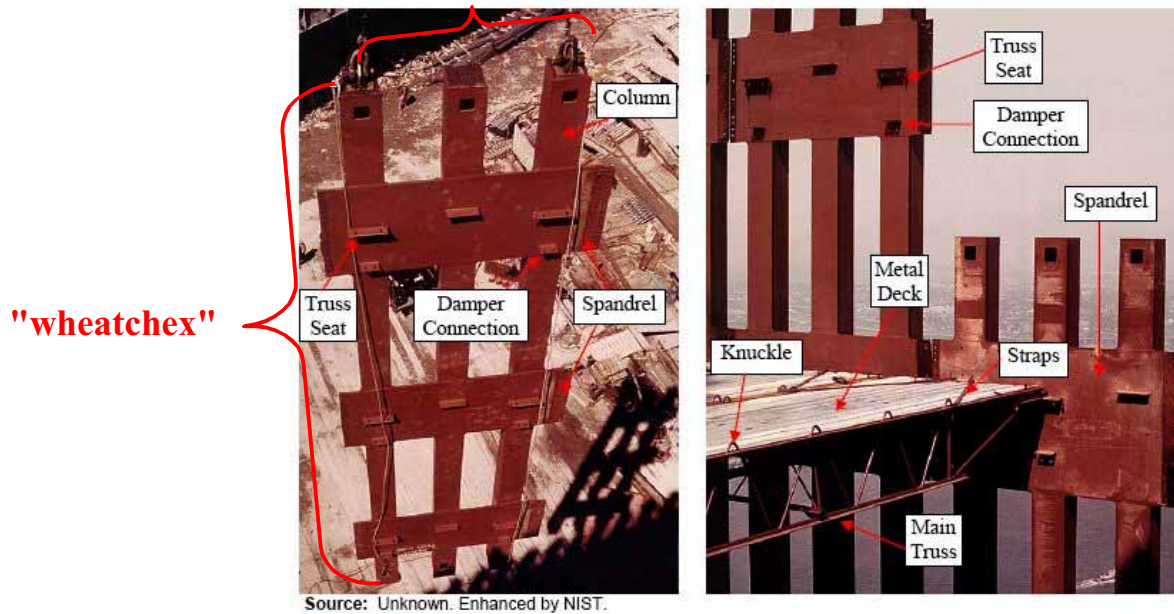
Perimeter column/spandrel assembly and floor structure.
